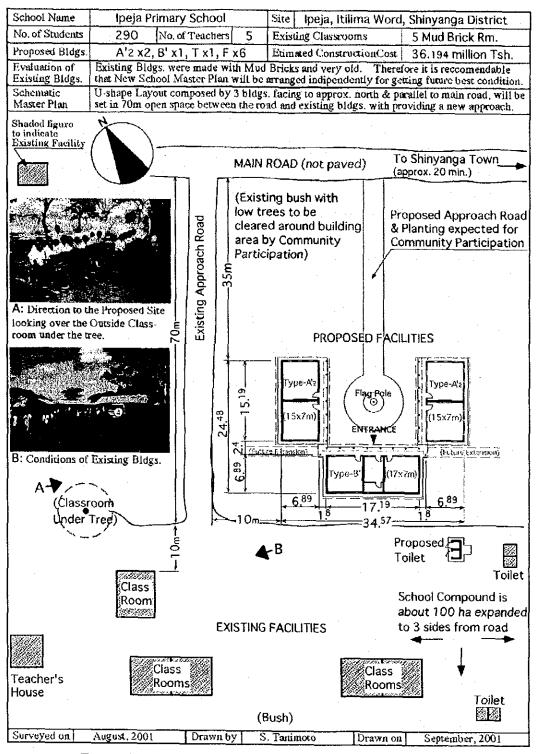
Schematic Master Plan (Ipeja Primary School)
